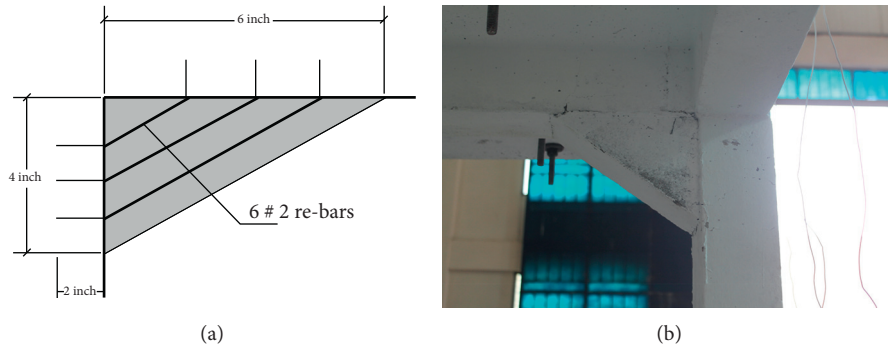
Geometric and reinforcement details of RC haunches for 1:3 reduced scale models. (a) Details of RC haunch (1:3 scale). (b) Pictorial view of the model haunch.
